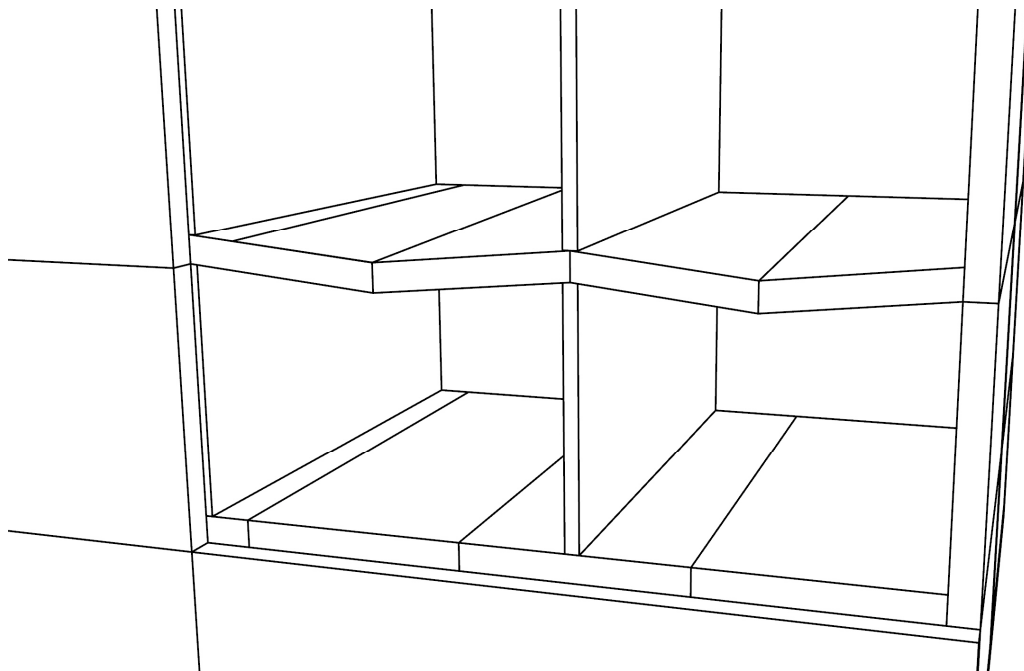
Interior wall acts as secondary support when the main support is lost.
